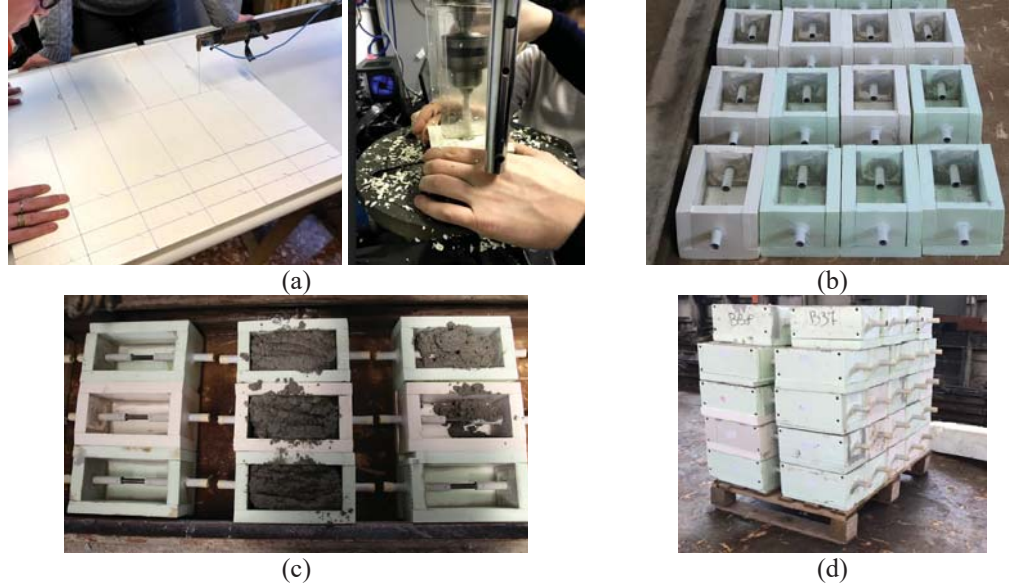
$c/d = 3.67$ bond specimens: (a) realization of the non-standard polypropylene formwork, (b) battery of the polypropylene formwork, (c) concrete casting in the precast plant, (d) specimens after the curing stage.
